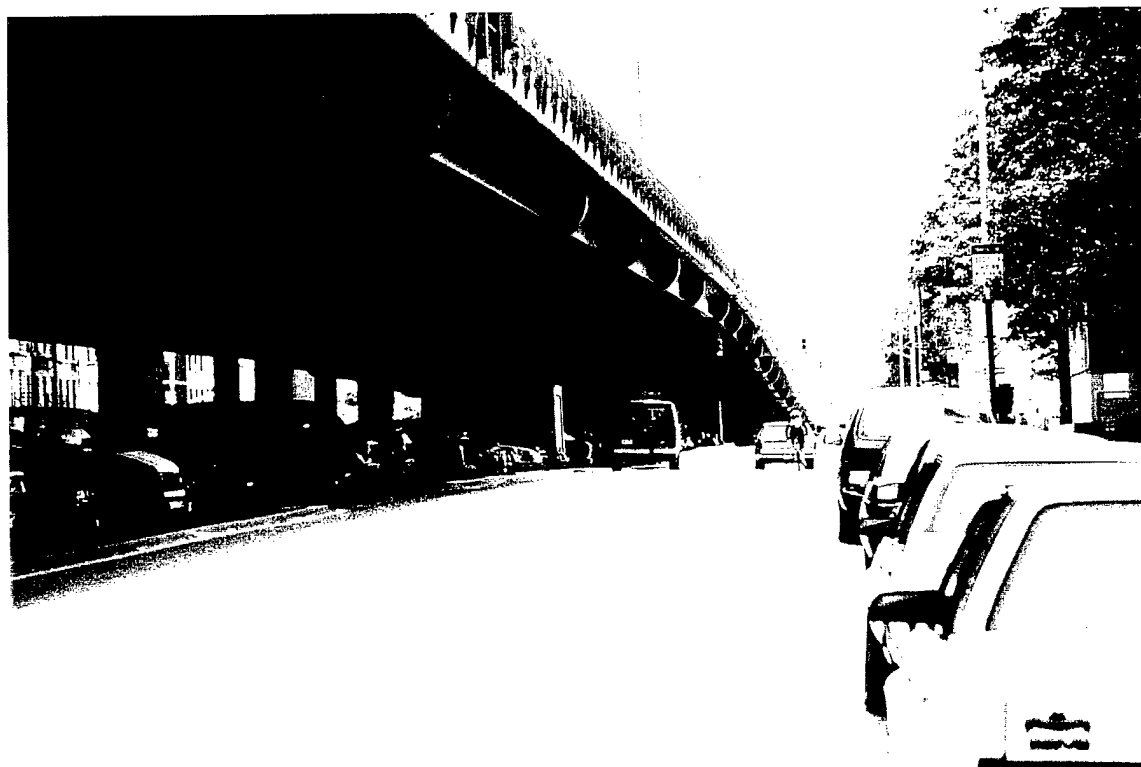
Brooklyn-Queens Expressway's elevated structure at Park Avenue.
